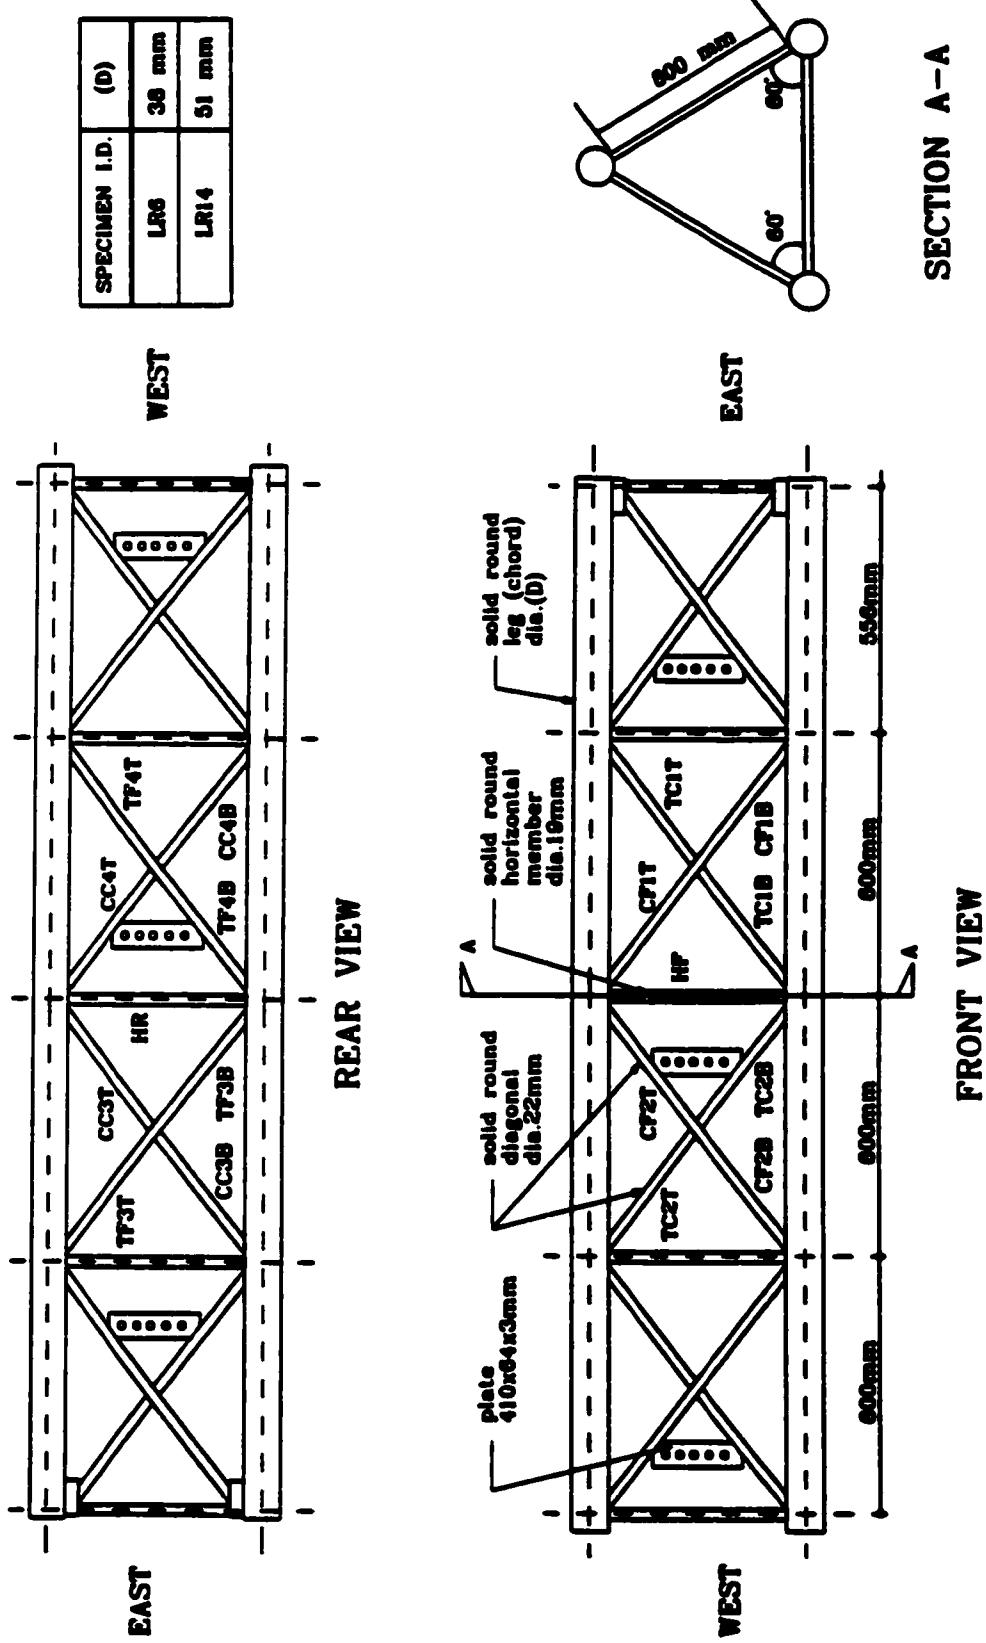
Dimensions of Specimens LR6 and LR14
